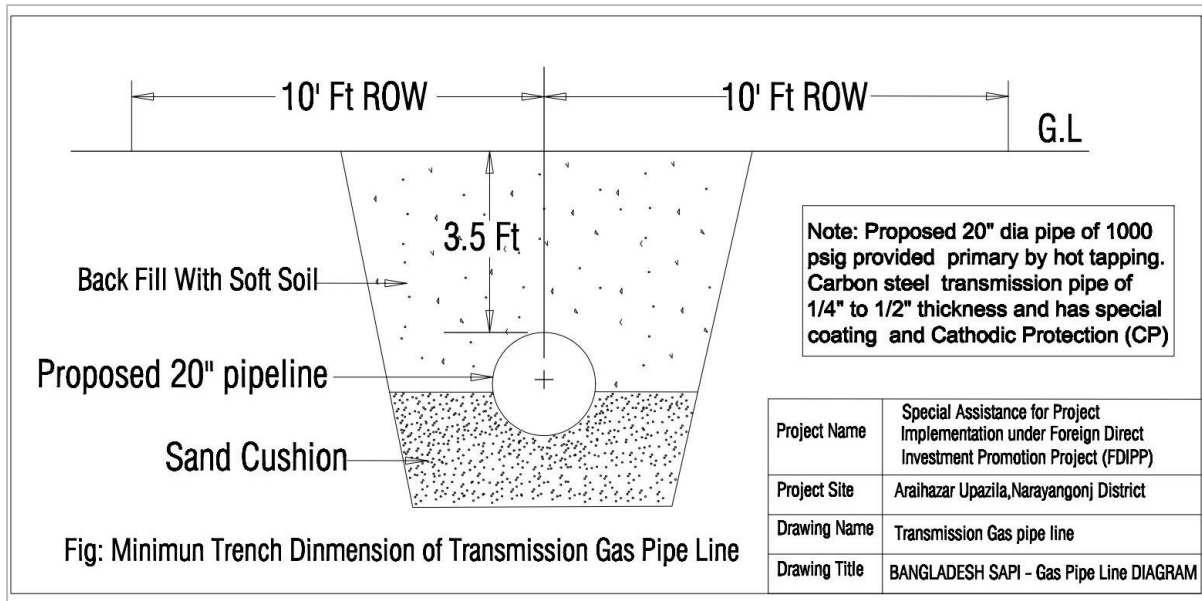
Typical Cross-section Drawing of the Gas Transmission Line
